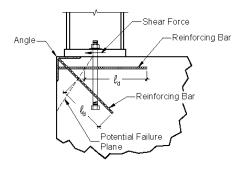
Concrete Reinforcement to Improve Shear Capacity Where Edge Distance is Limited
